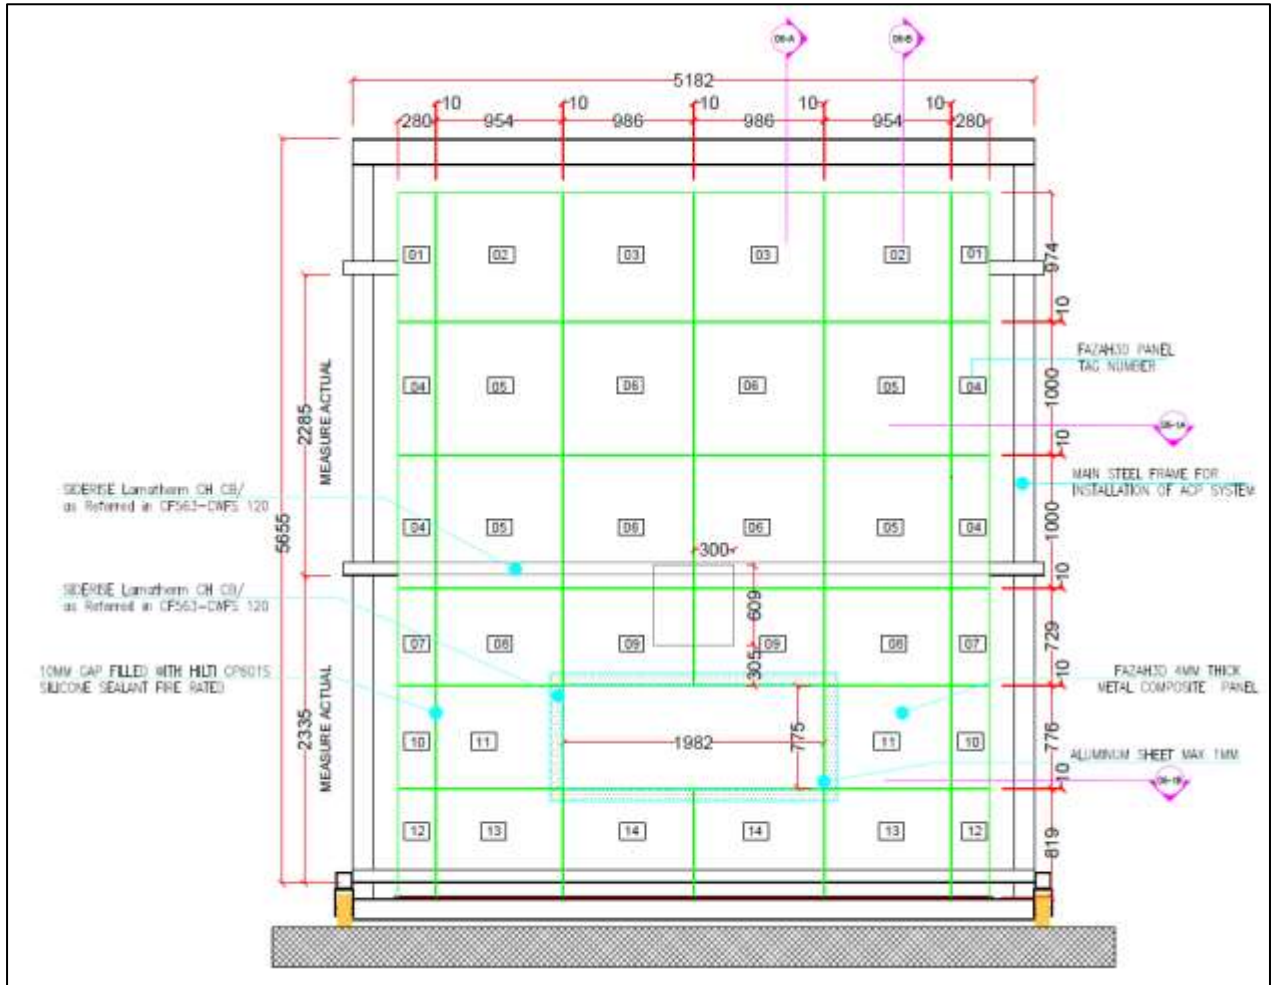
Elevation of the wall brackets fixed onto the basewall.
